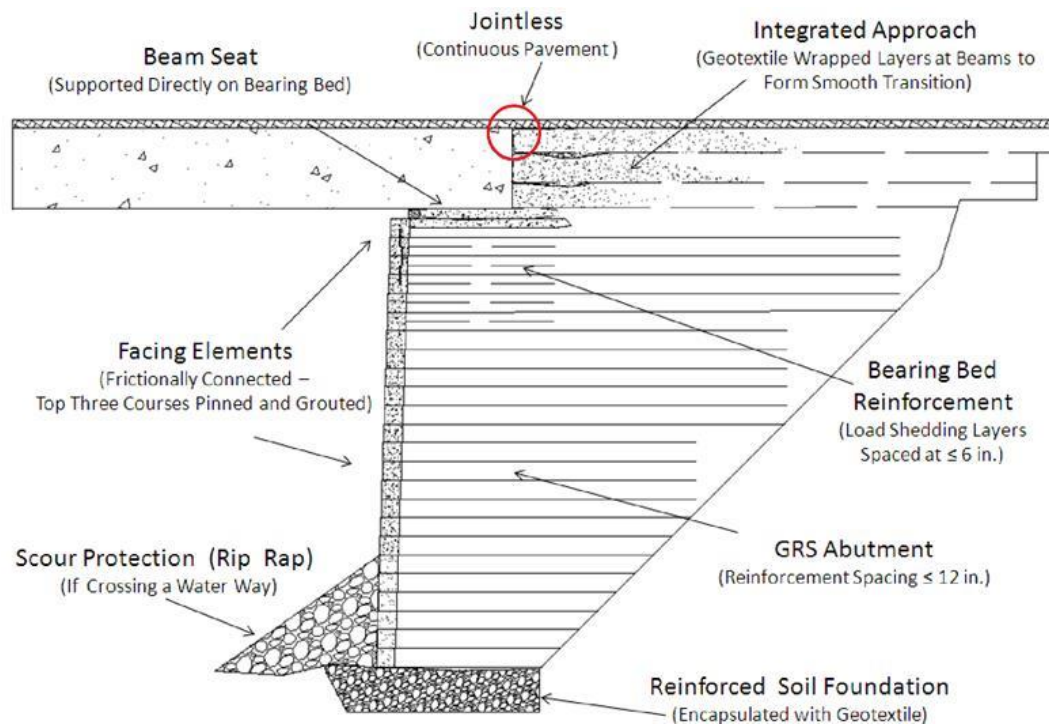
Typical GRS-IBS cross-section (Adams et al. 2012)
